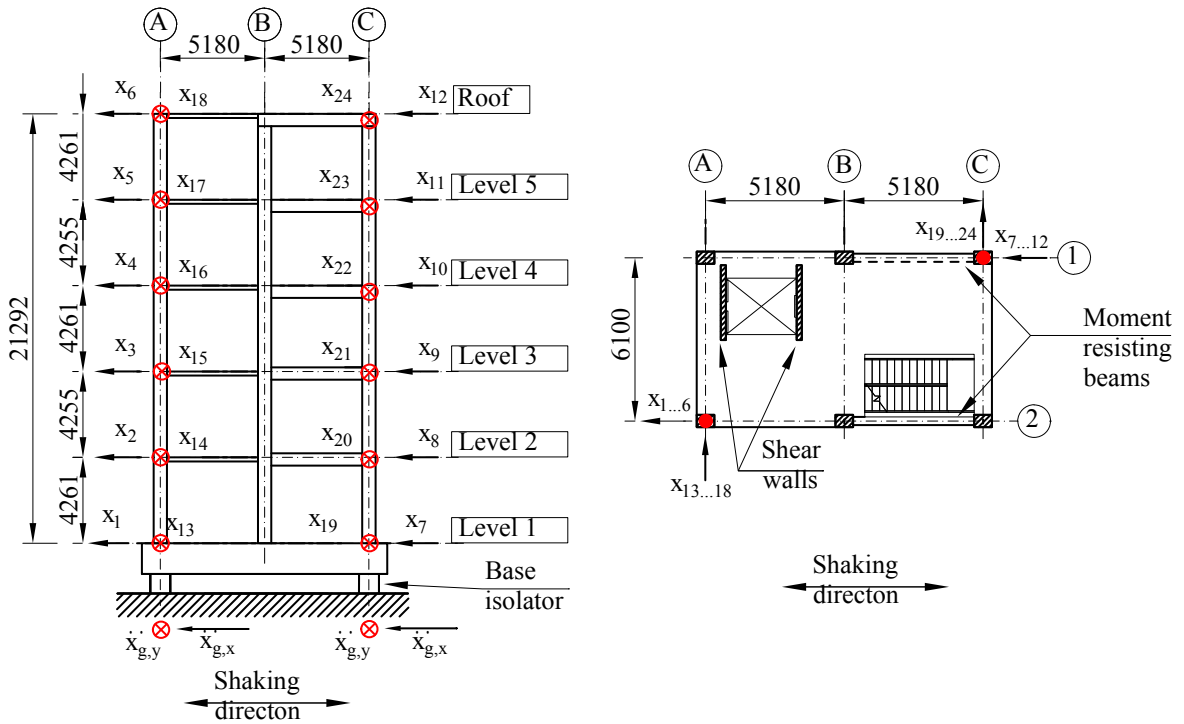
Front and plan views of the 5 storey concrete structure and accelerometer spatial arrangement
